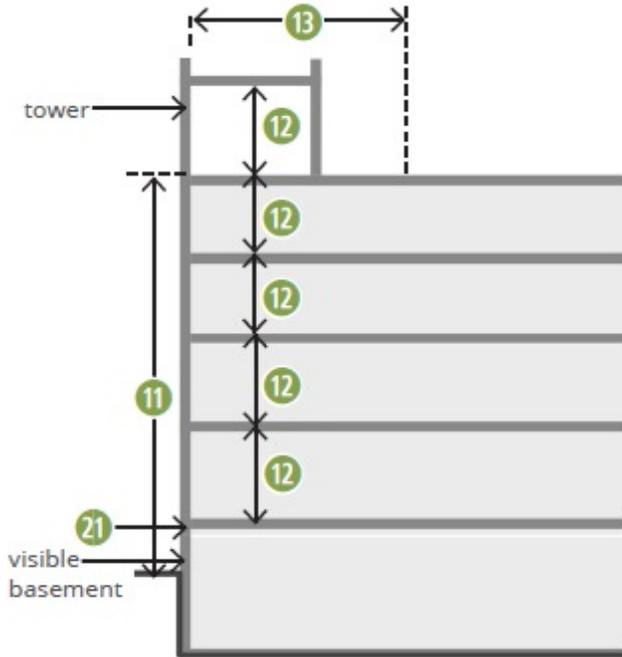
C. Parking Structure: Height and Uses Requirements.
